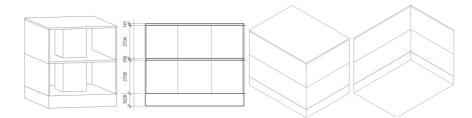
REVIT BIM MODEL – ATRIUM SPACE WITH ROOF AND FLOOR COVERING THE WHOLE BUILDING FOOTPRINT – LEFT: 3D VIEW. MIDDLE: ELEVATION VIEW. RIGHT: ROOF AND FLOOR AS ONE ELEMENT
